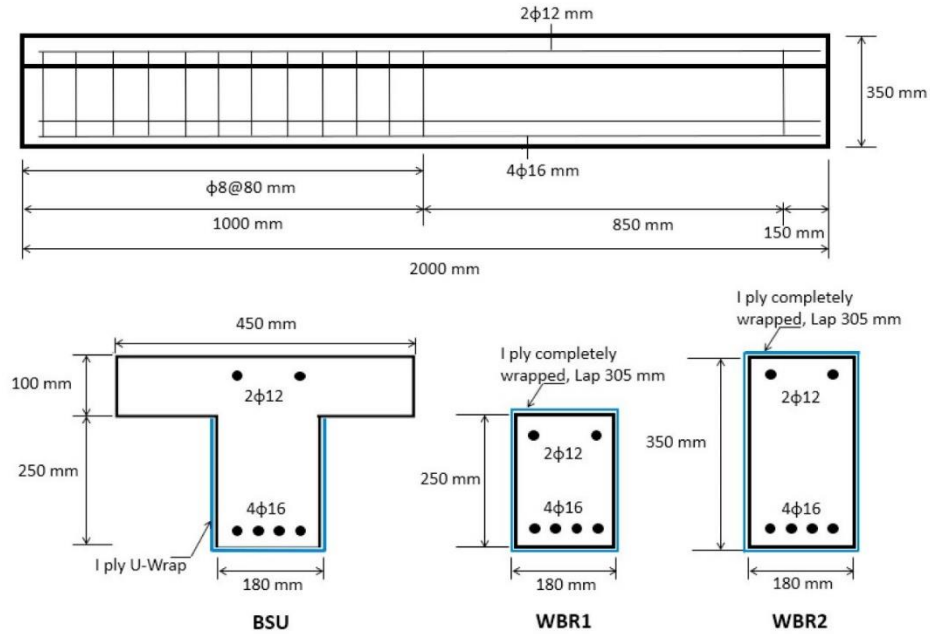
Side view and cross-section of reinforcement detailing of beams (Mhanna et al. 2019)
